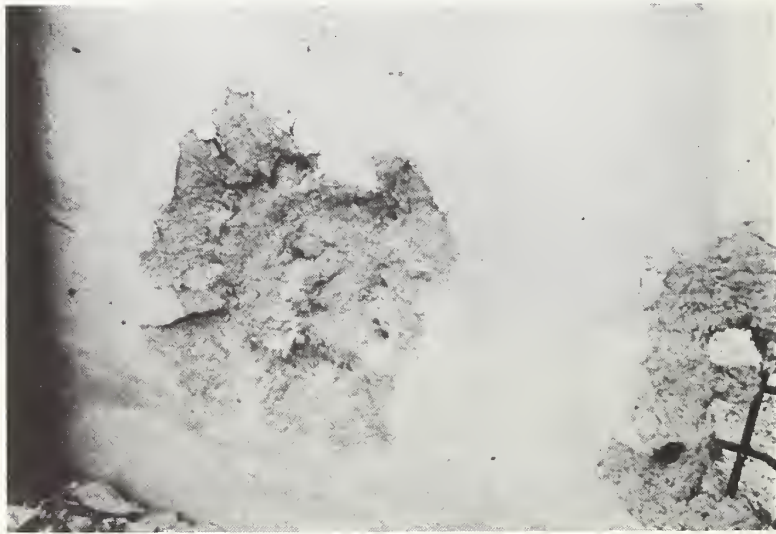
6E2. Rear view of slab after second set of holes had been spalled
